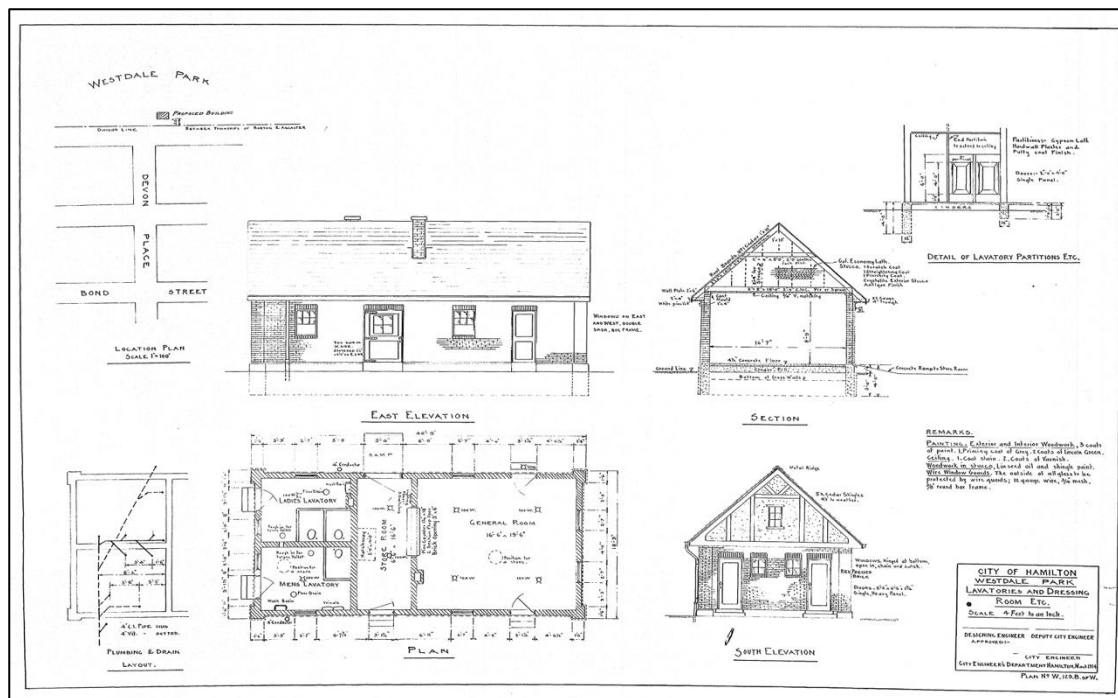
Original Plans for Westdale Park (now Churchill Park) Lavatories and Dressing Room (1934)
